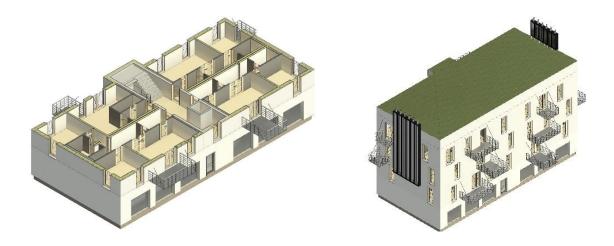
Axonometric views of the RESBy building model. Source: (17)
